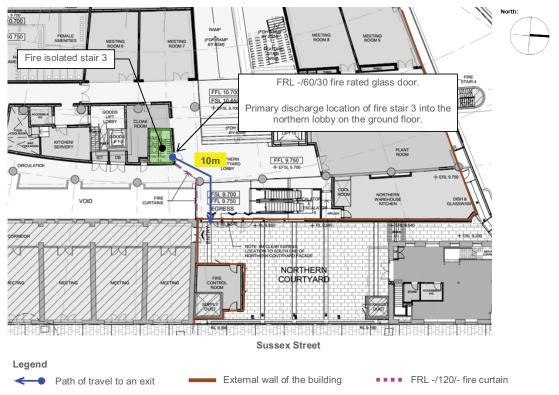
Primary discharge location of fire isolated stair 3 on the ground floor
